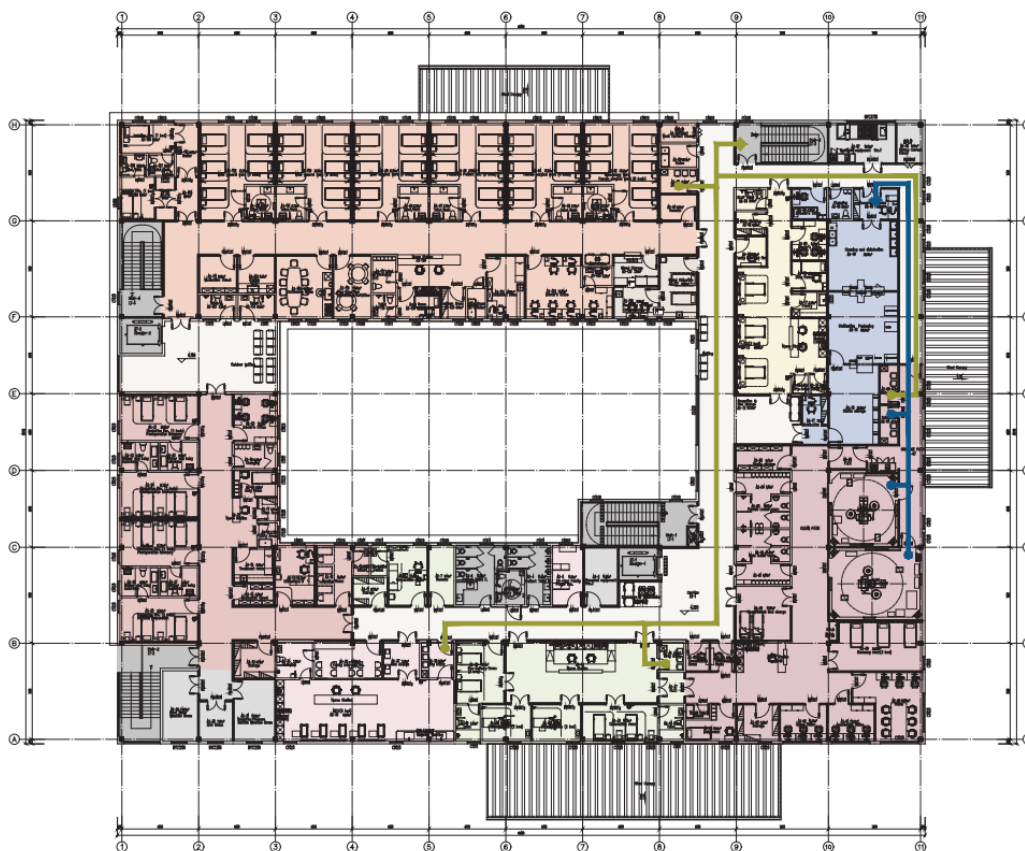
Proposed design of the floor plan of the first floor of the Hospital
